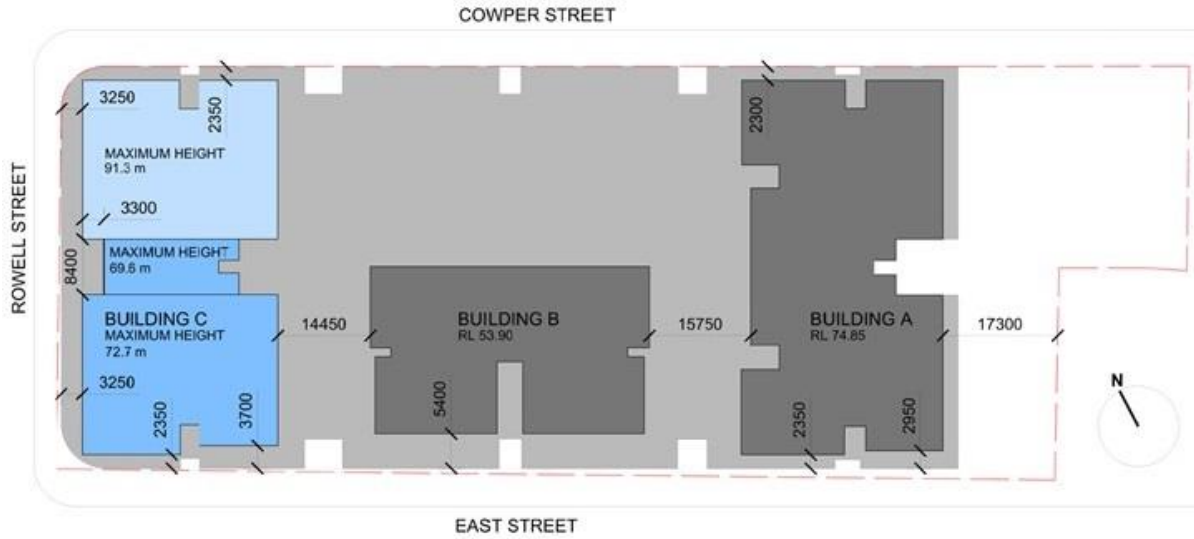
Building C Envelope, Heights and Setbacks
